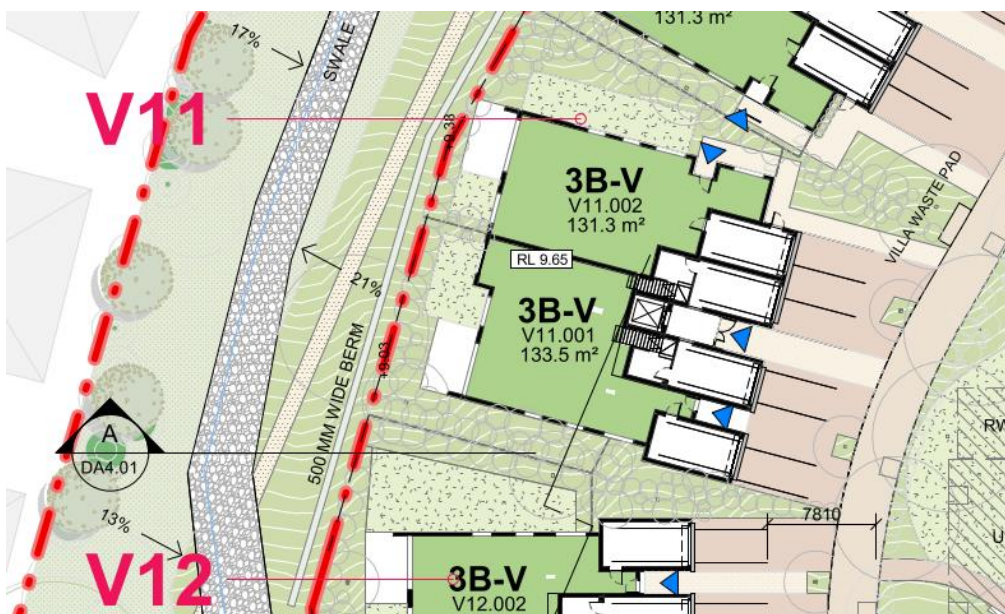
Villa building 11 showing 3 spaces in front of two garages, requiring 2 cars to be moved to access the garage. Note also the tree planted in the centre of the access to the middle space.
